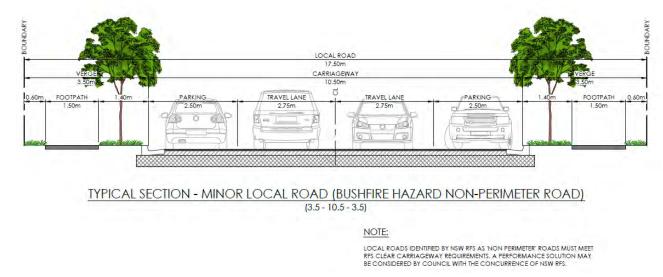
Minor Local Road (Adjacent to Local Park/ District Park 3)
